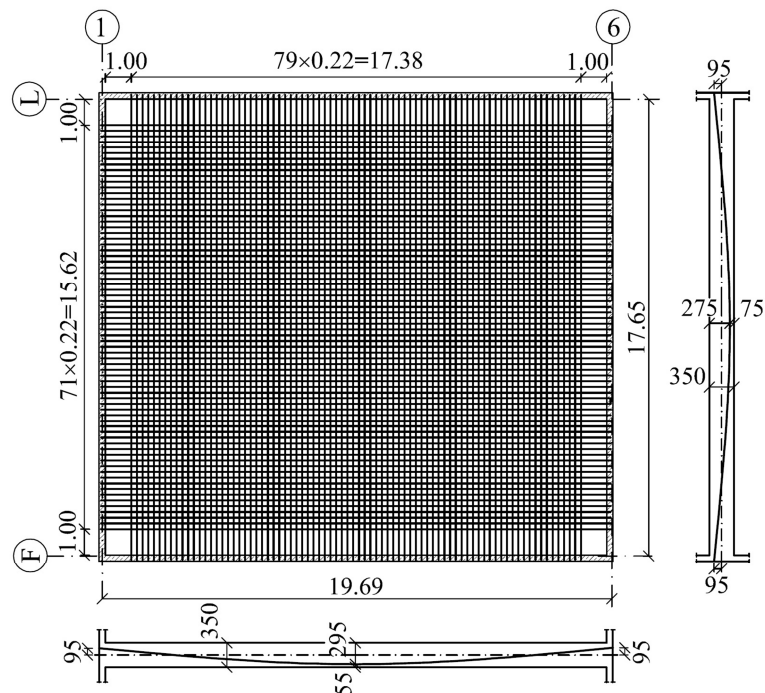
Prestress layout at the slab SI-3 over the cinema hall.
